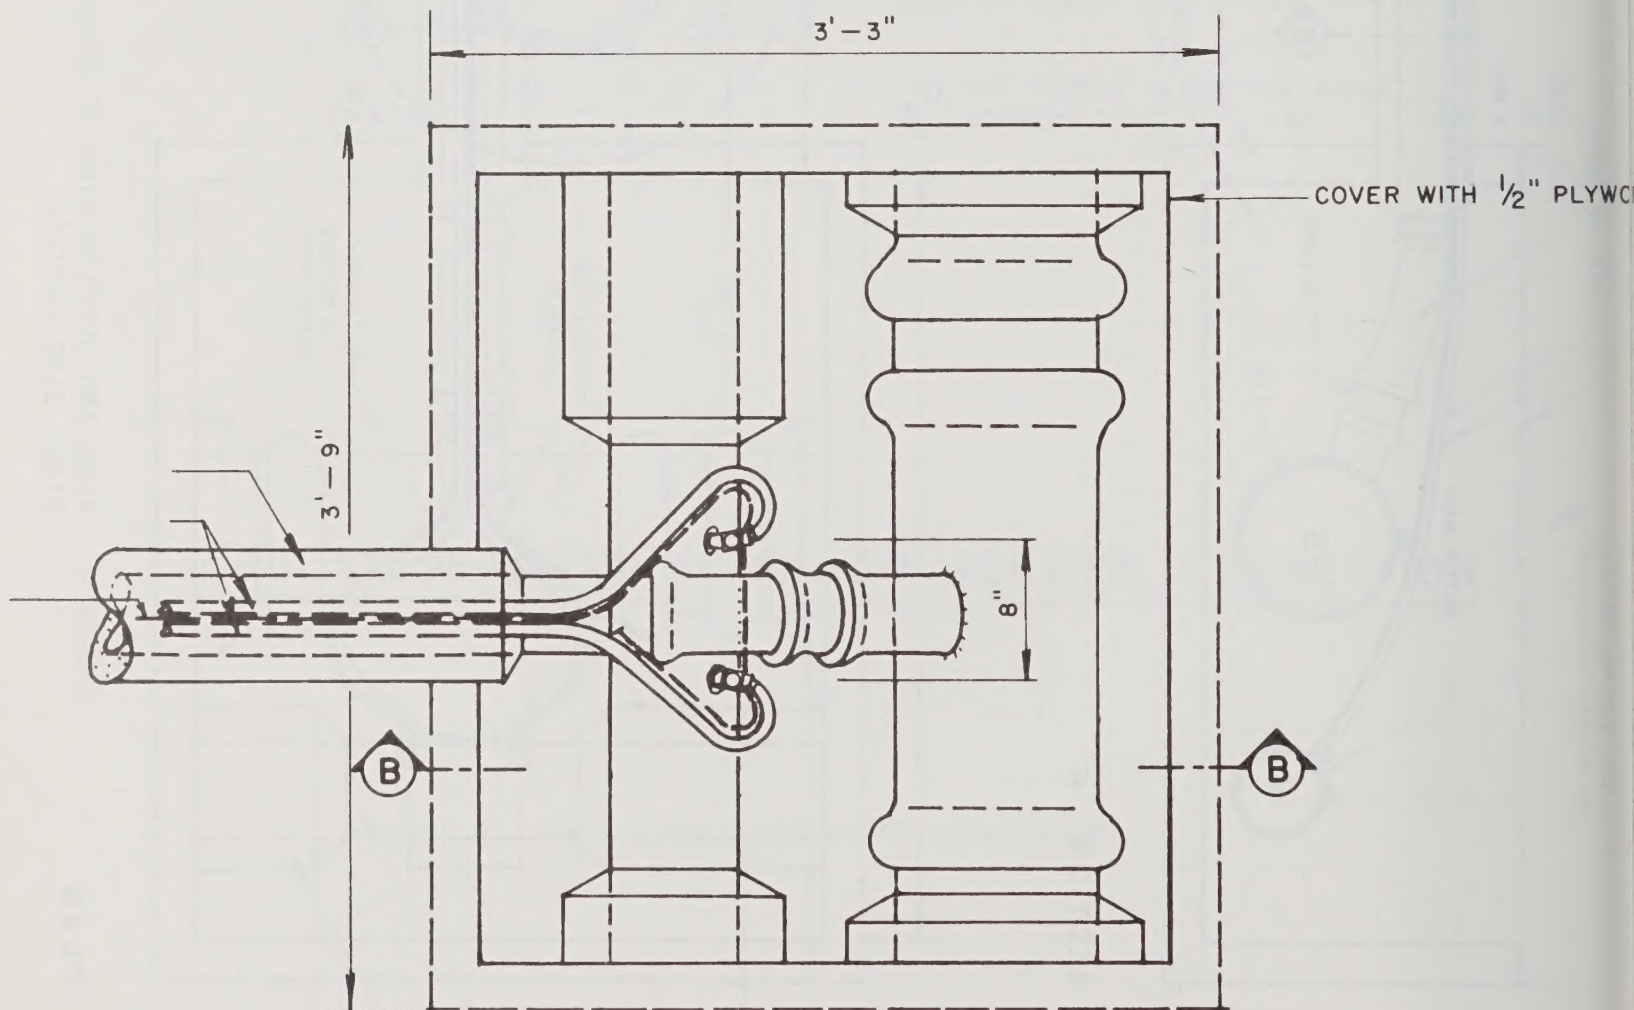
PLAN AND SECTION VIEW OF HOUSE CONNECTION SERVICE BOX. RIGHT SIDE SERVICE
